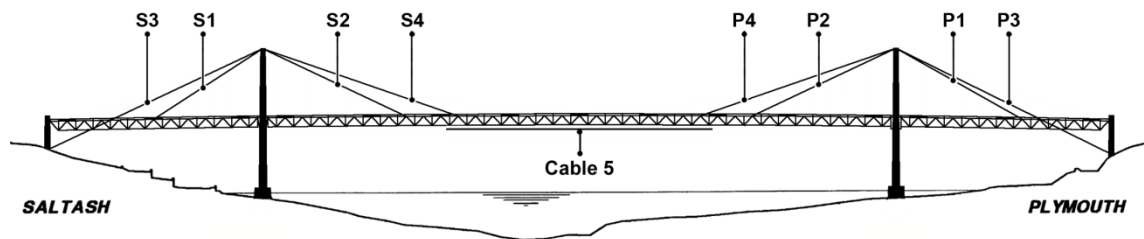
Additional stay cables in the strengthening and widening scheme.
